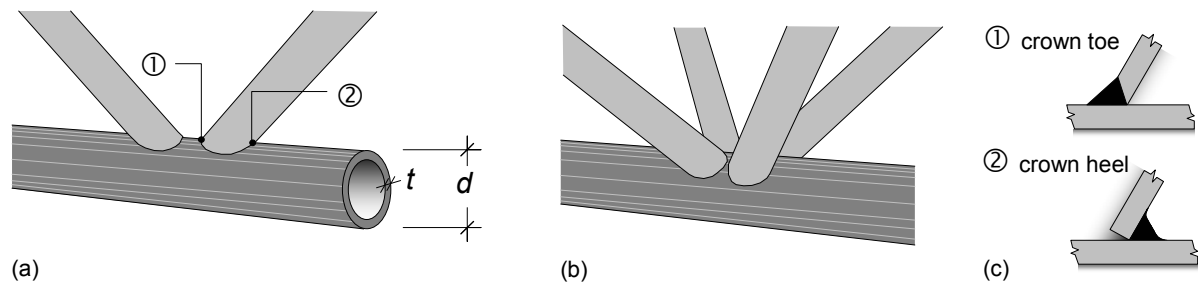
Welded uniplanar K-joint (a) and multiplanar K-joint (b), weld configuration (c)
